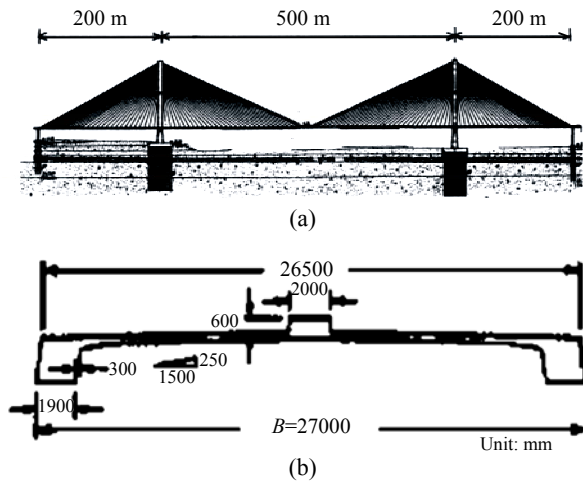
General layout of the Jingsha Bridge. (a) Elevation; (b) Cross-section of the stiffening girder
